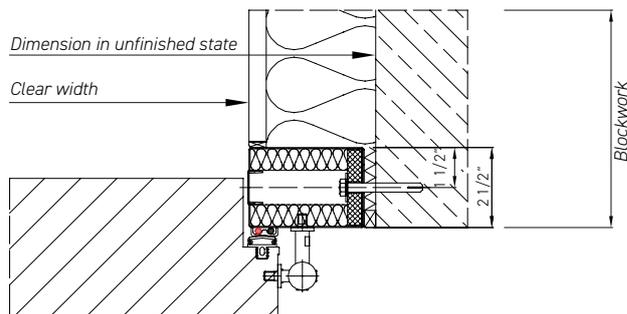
Block / Block frame with pocket holes in the reveal area
